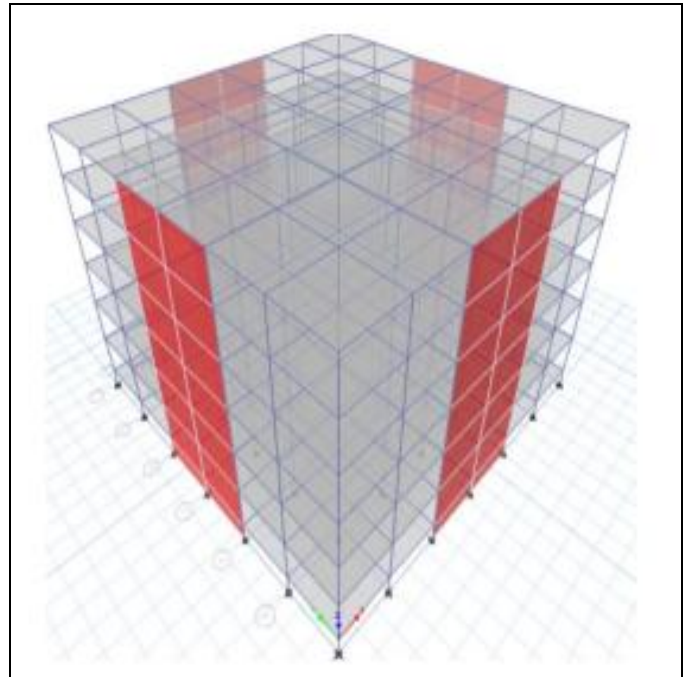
Multi storey building with RCC shear wall on Periphery at Centers
